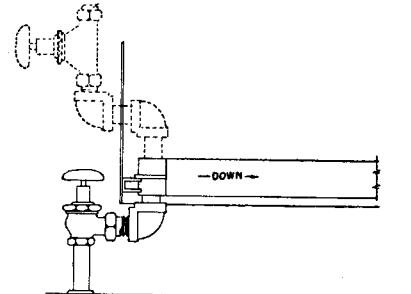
Using Angle Valve for Up-feed connections with Alternate Down-feed connections using Non-offset Straightway Valve.
